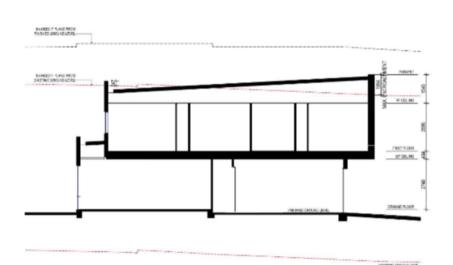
AN EXTRACT OF THE SECTION PLANS FOR LOT 2-09, WHICH DEMONSTRATES HOW CHANGES TO THE GROUND LEVELS CAUSE SOME TWO STOREY DWELLINGS TO BREACH THE NINE METRE BUILDING HEIGHT STANDARD (DENOTED BY THE TOP RED-DASHED LINE). IT SHOULD BE NOTED THAT CHANGES TO GROUND LEVELS ARE PRIMARILY ATTRIBUTABLE TO BUILDING HEIGHT BREACHES WITHIN SUPERLOT 2.
